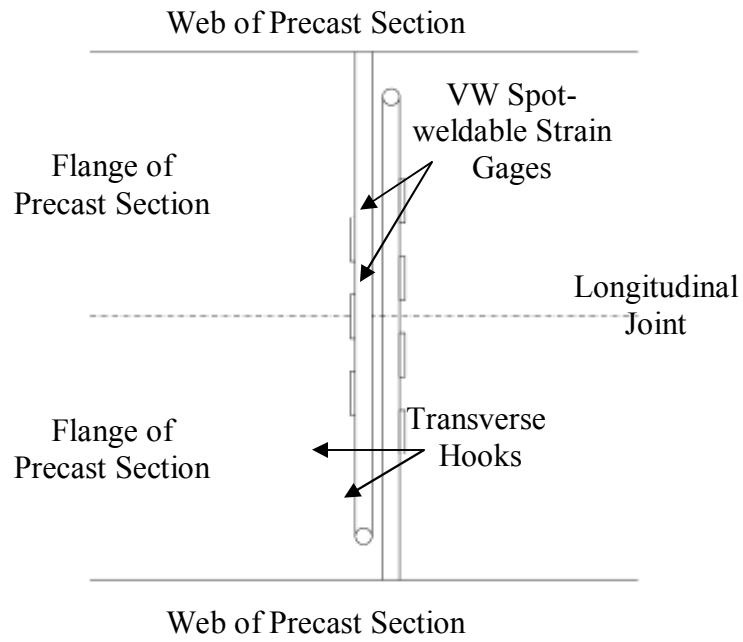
Plan view of instrumentation detail for VW spot-weldable strain gages on transverse hooks
